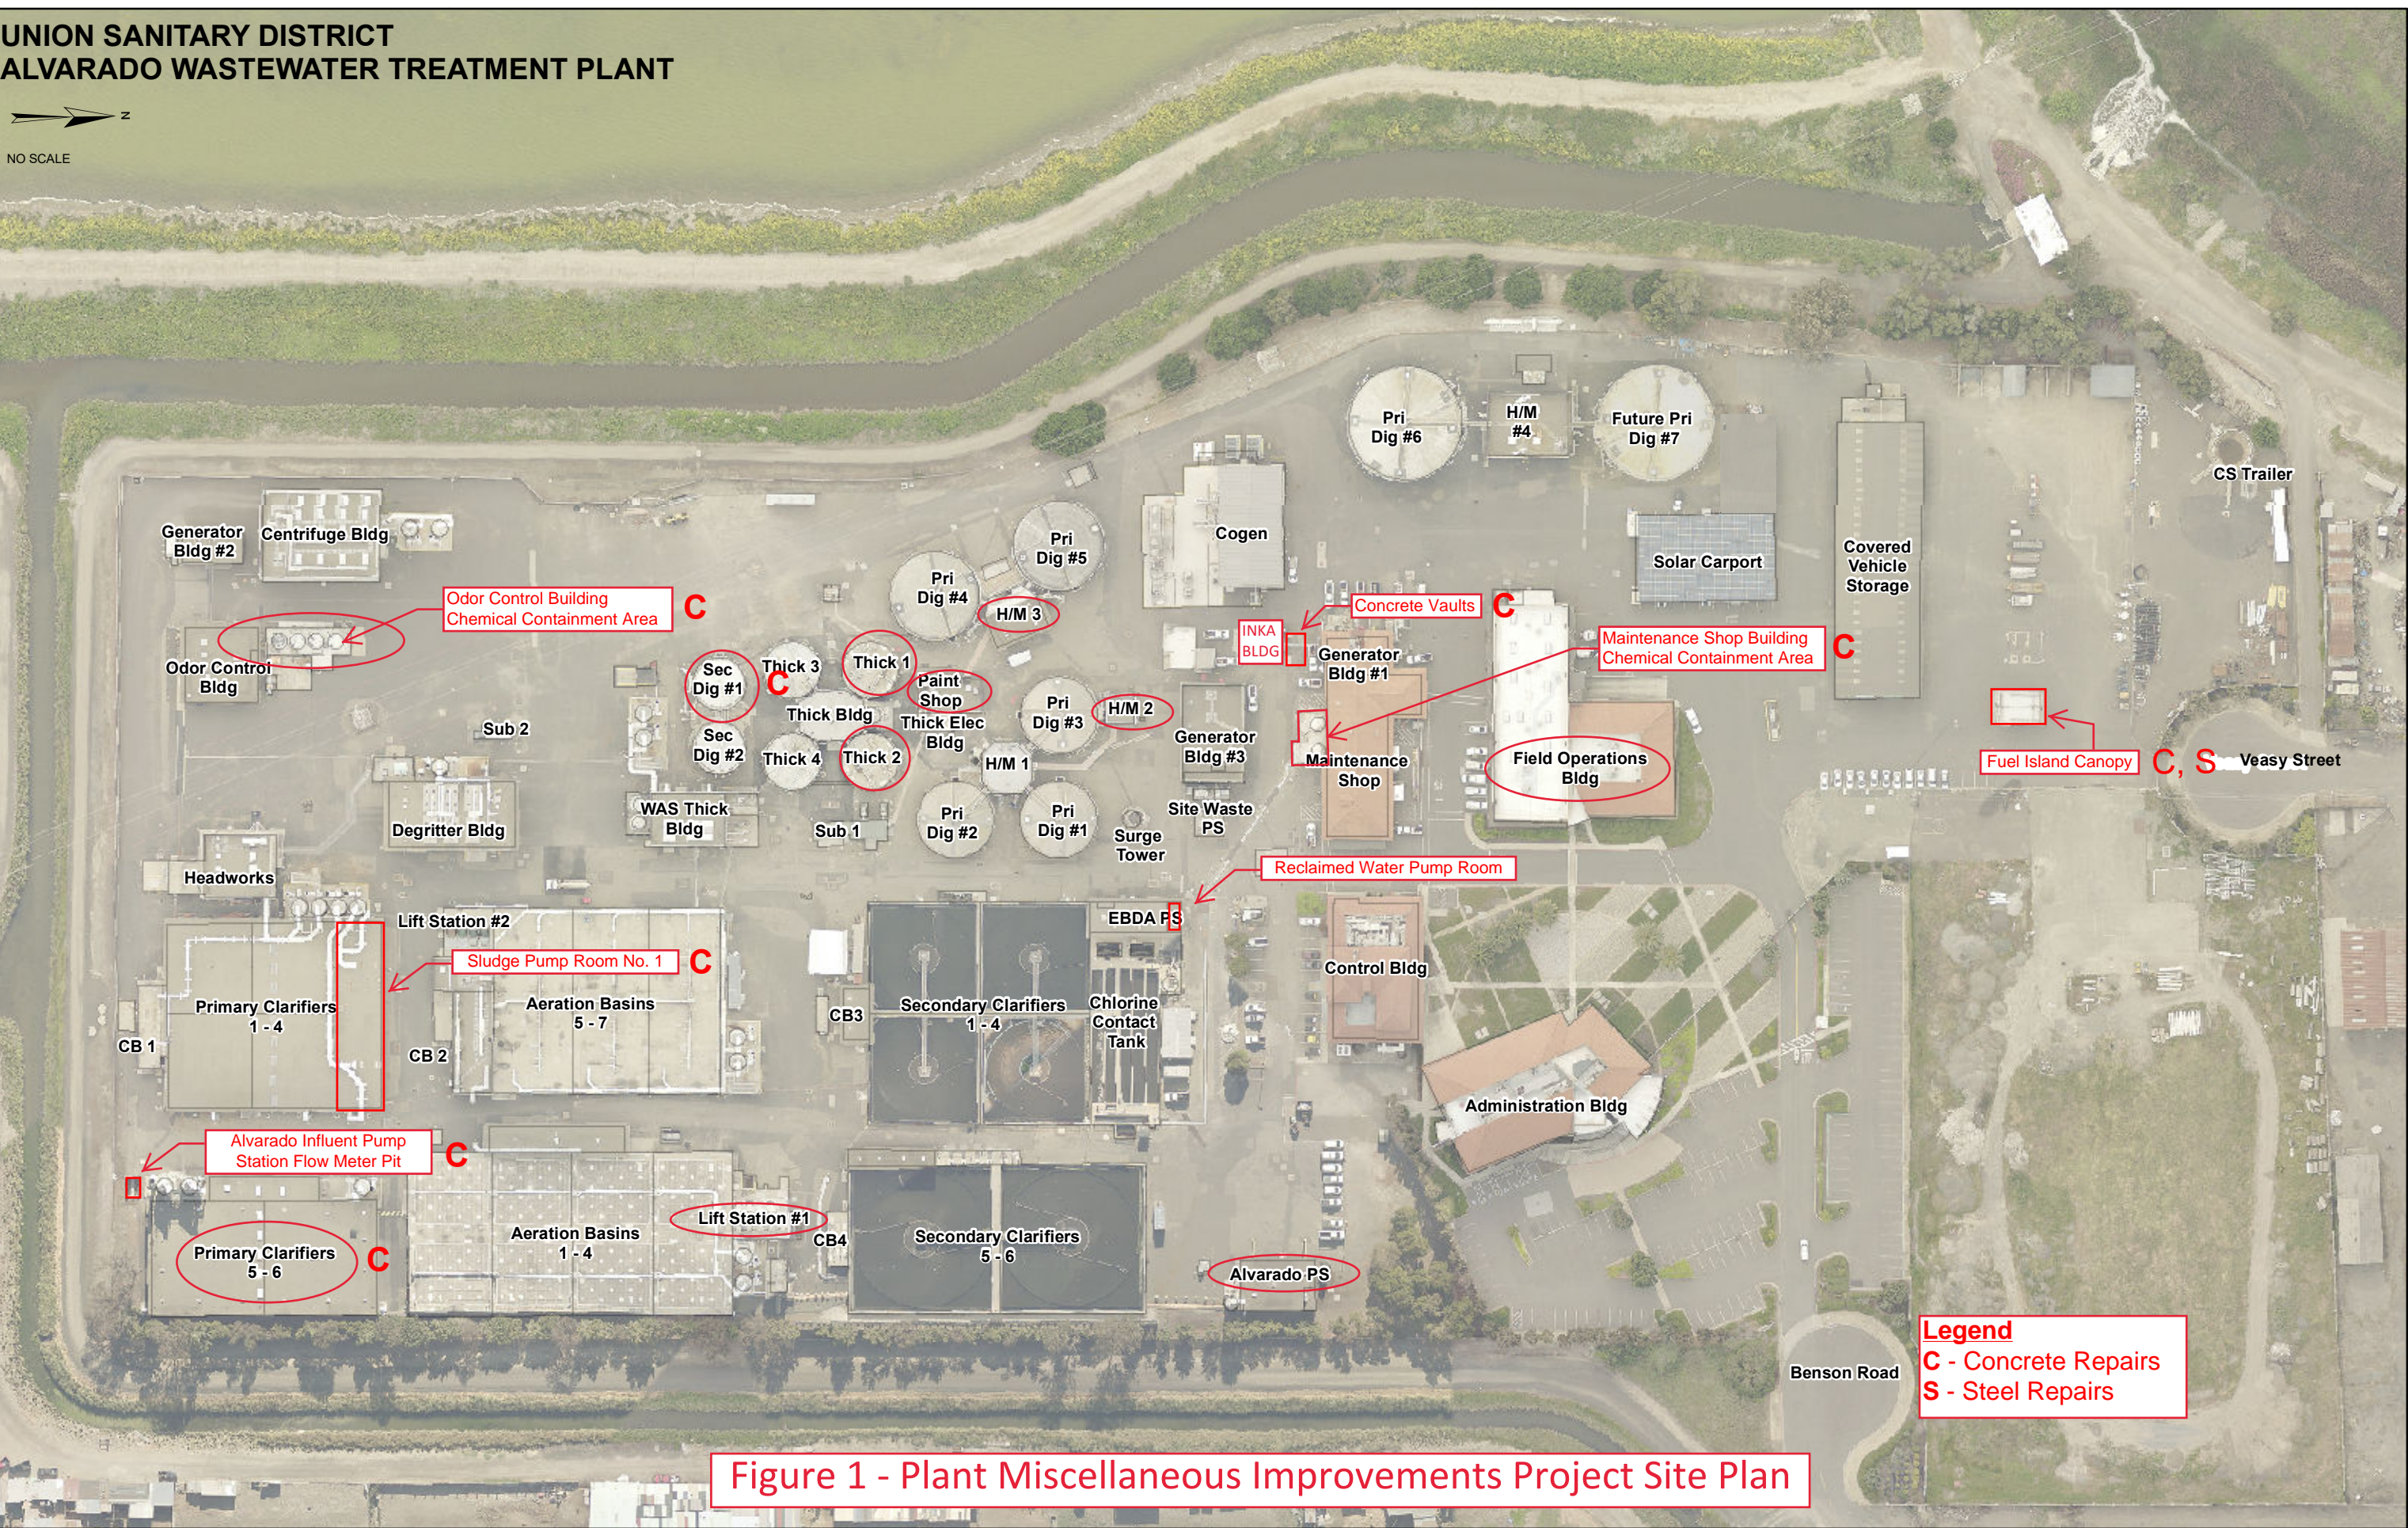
Plant Miscellaneous Improvements Project Site Plan
